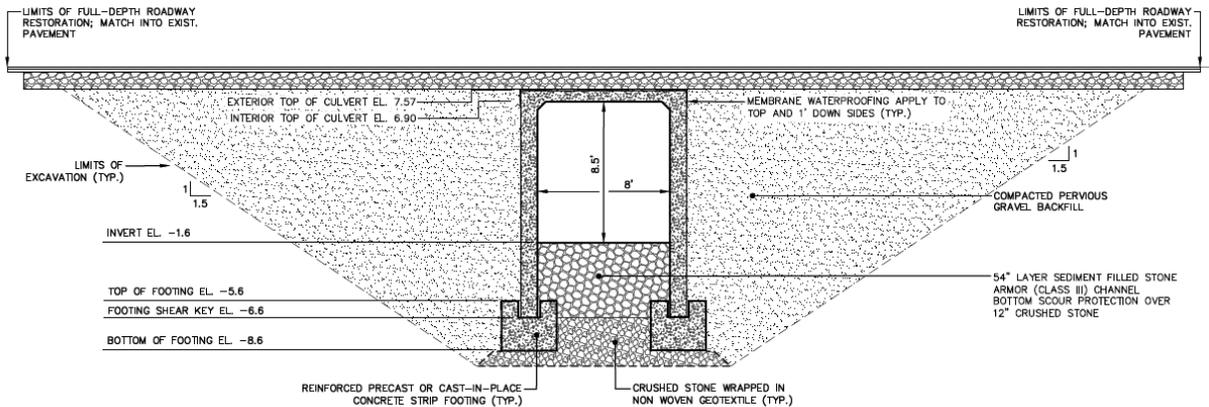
Alternative 2: 8 foot wide by 8.5 foot high open bottom culvert.
